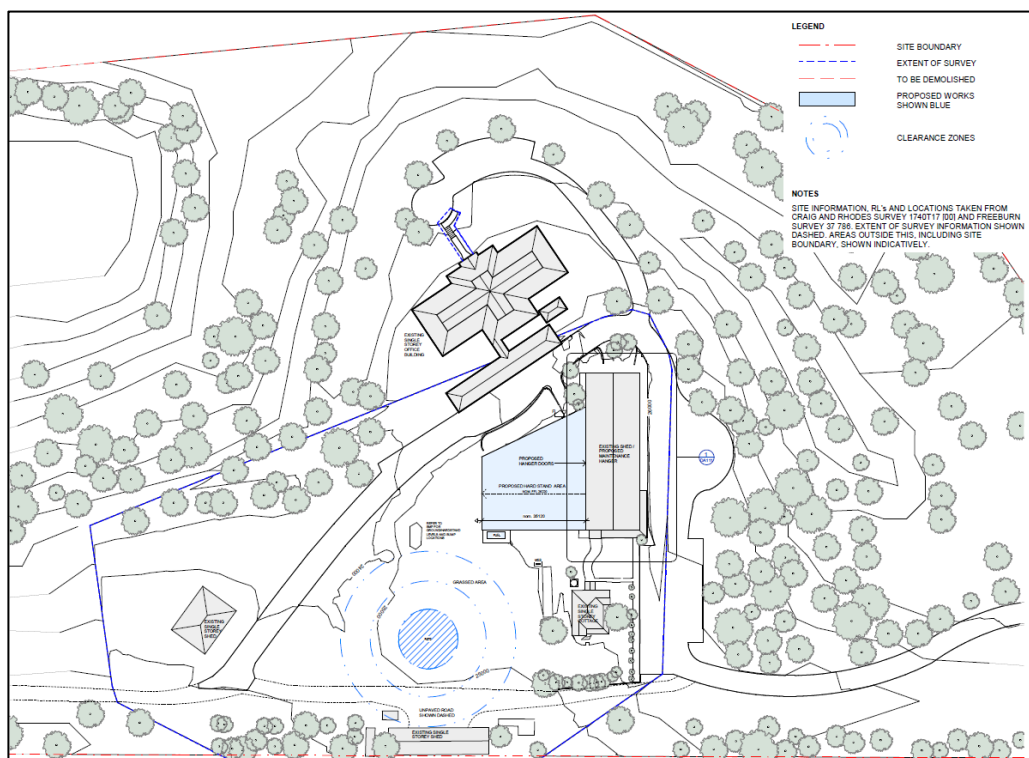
Proposed Site Plan (Source: WMK Architecture)
